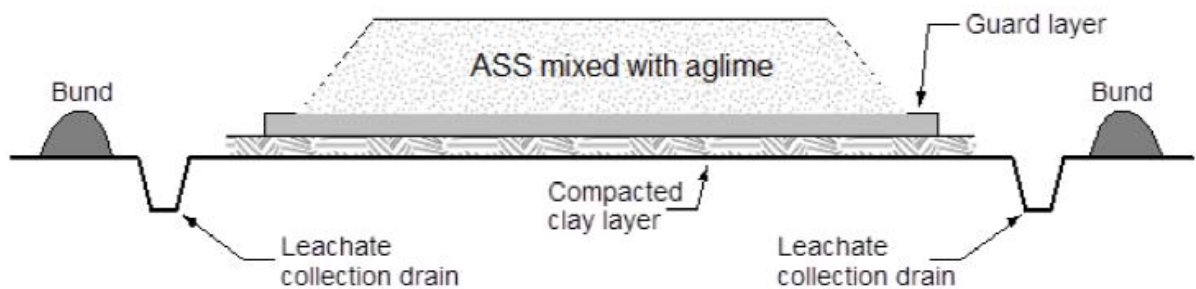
Schematic cross-section of a treatment pad, including clay layer, guard layer, leachate collection drain and bunding¹
